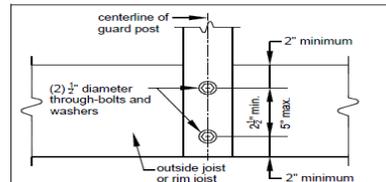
GUARD POST ATTACHMENT DETAIL
